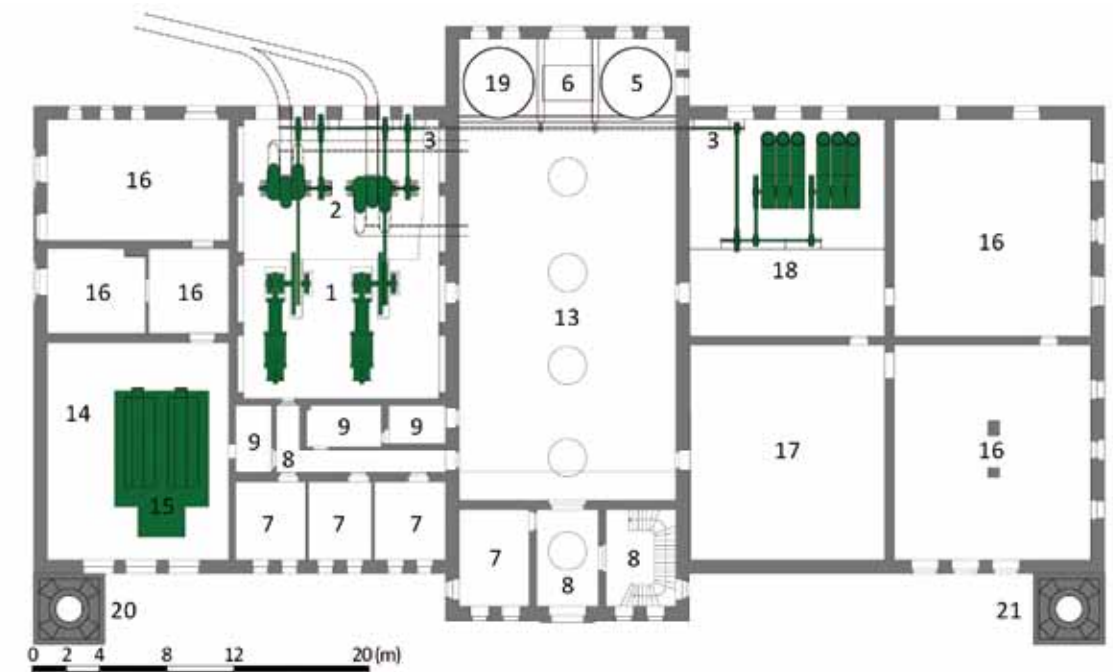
Prague-Bubeneč, old wastewater treatment plant, ground plan of the main building: 1 – machine room, a pair of steam single-cylinder double-acting horizontal machines, 2 – machine room, centrifugal water pumps – flood control pumps, 3 – power transmission of water pumps, 4 – sand trap, 5 – sand and clean water reservoir, 6 – service lift; 7 – offices, 8 – halls, staircase etc., 9 – social and hygienic rooms, 10 – laboratories, 11 – inflow from sewers into the sand trap, 12 – outflow from the sand trap into sedimentation tanks, 13 – sand trap hall, 14 – boiler and coal rooms, 15 – two compound Cornish-type flued boilers, 16 – storage space, archive etc., 17 – switch room and storage space, 18 – piston water pumps, 19 – sludge reservoir, 20 – chimney for the removal of combustion products from boilers, 21 – ventilation chimney, sewer odour removal system. Diagram by Radek Mišanec, 2021 (modified according to: archive project documentation).
